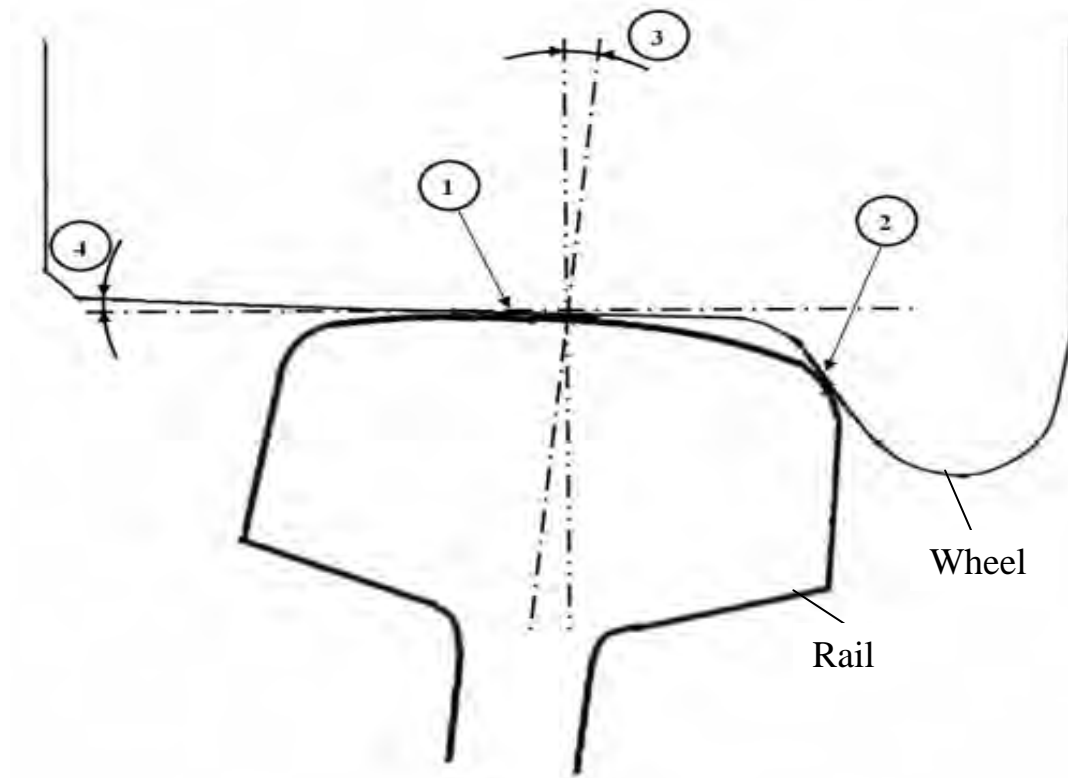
Schematic of two types of wheel–rail contact: 1. wheel tread–railhead contact and 2. Wheel flange–rail gauge contact; 3. rail inclination; 4. conical wheel profile [1, 2]
